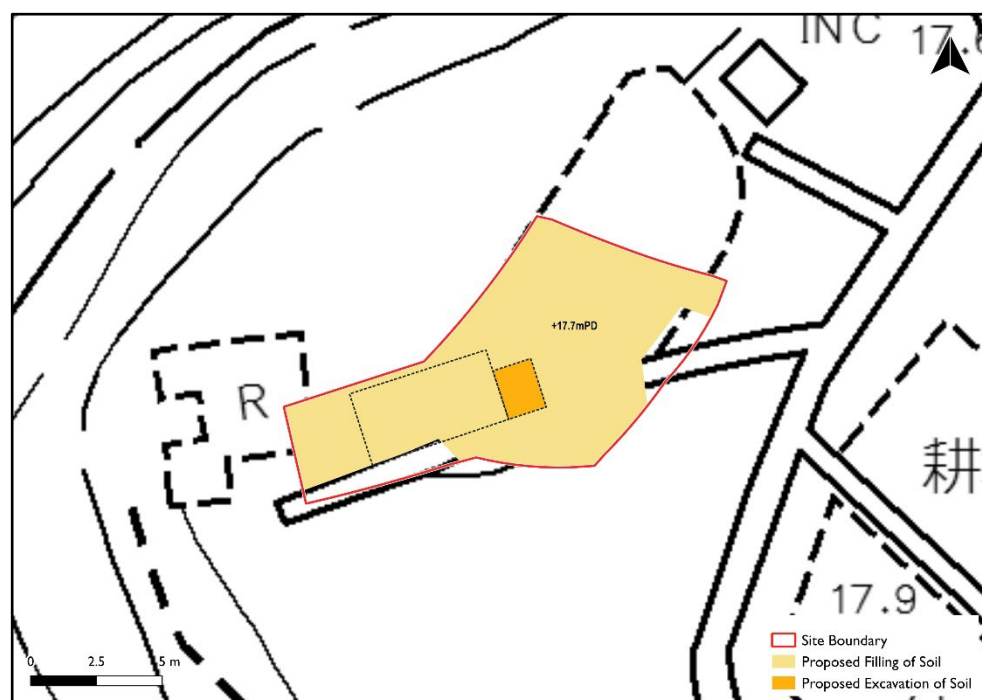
Proposed Areas of Filling/Excavation of Land
